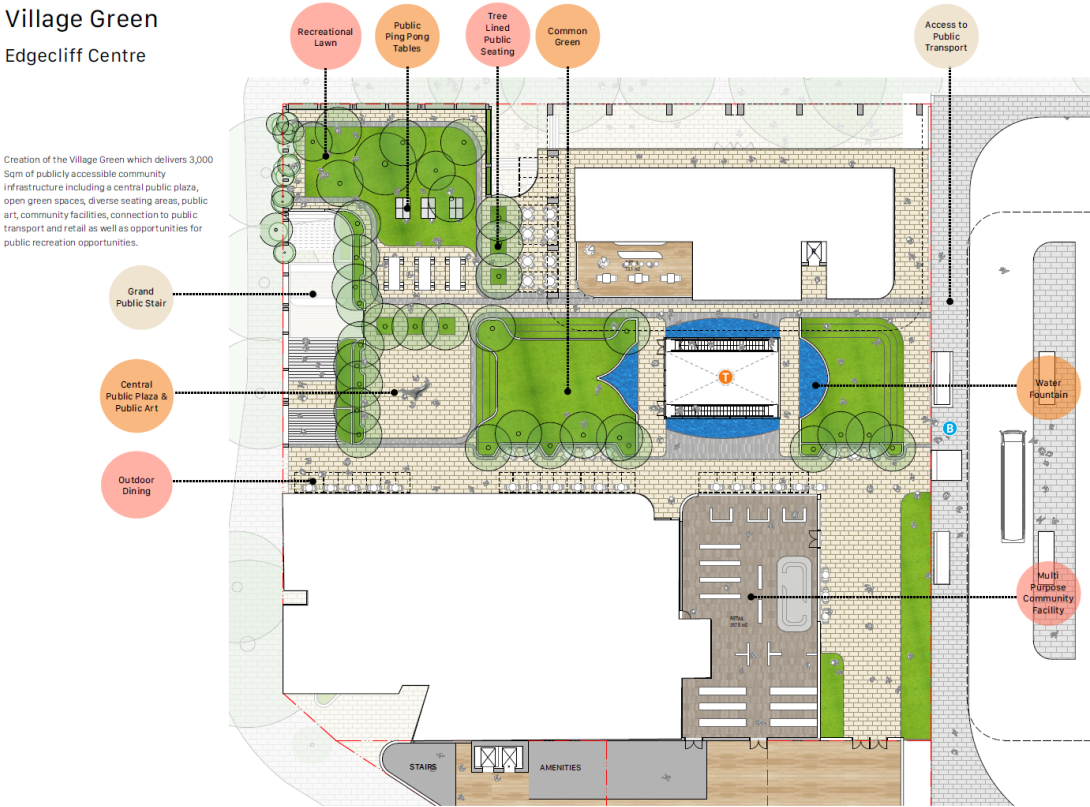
Indicative Publicly Accessible Open Space Concept (in Plan)
